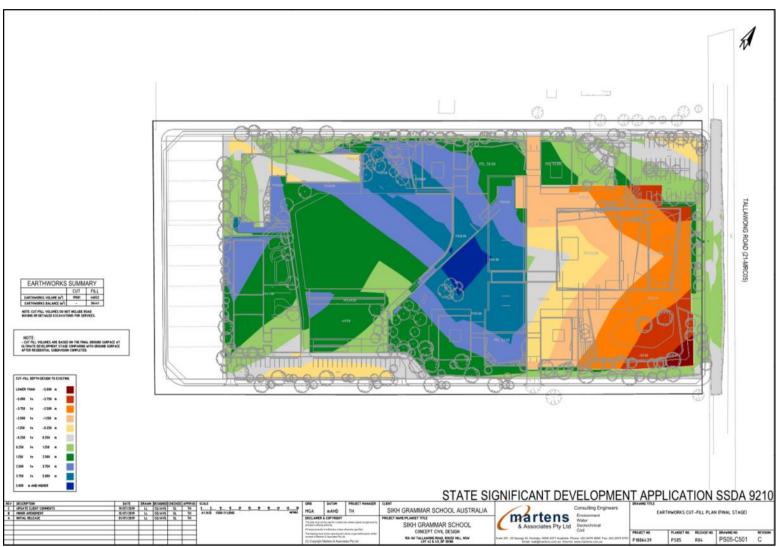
Proposed Earthworks Cut & Fill Plan – Final Stage (Source: Martens, 2019)
